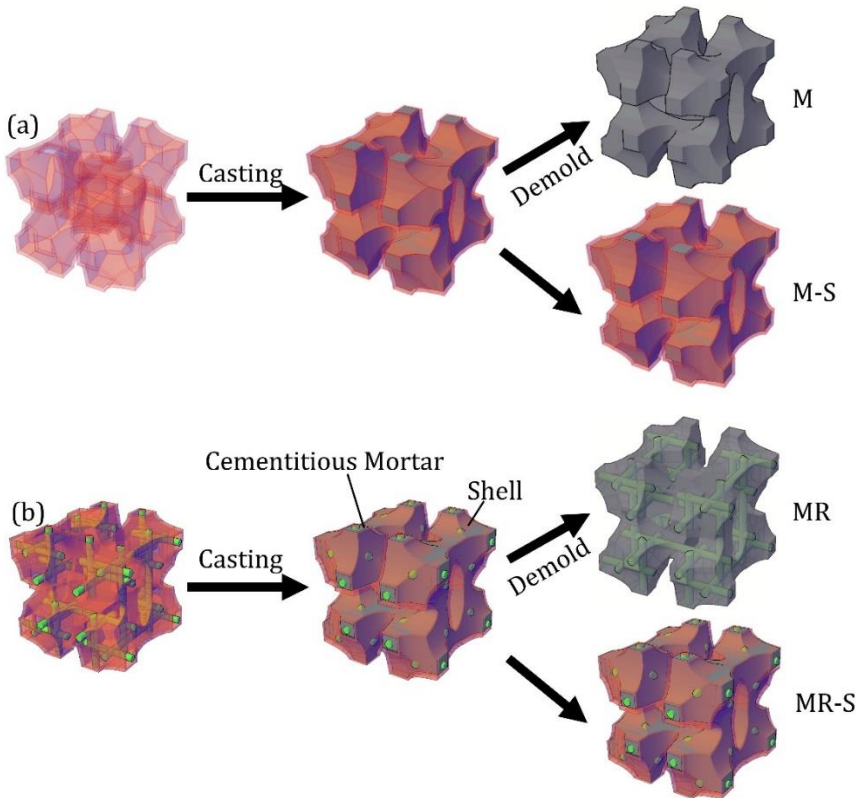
Schematics of a) ABS shell mold, b) shell mold with reinforcement and c) casted specimen
